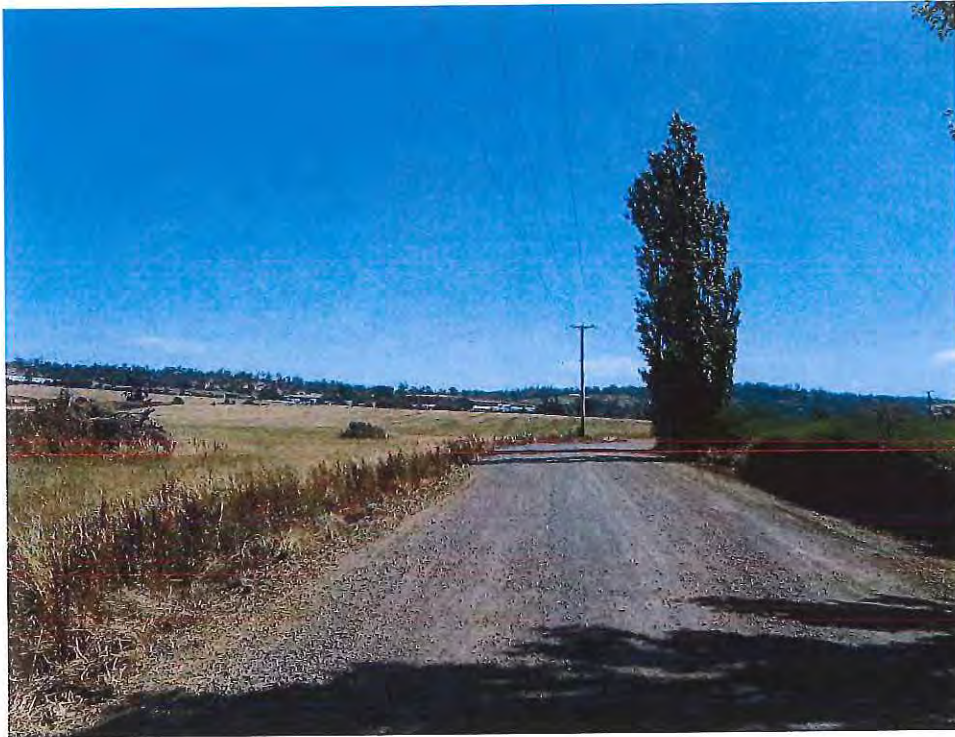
View to east along McGrath Road around 260m east of Hobart Road
